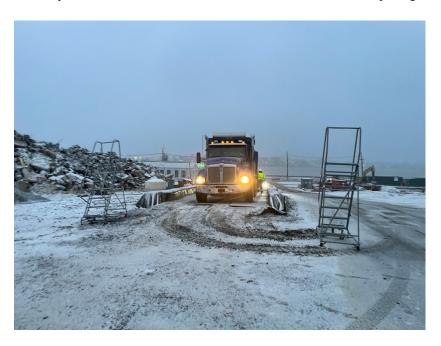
View of truck wash station, IRM 1 Central Area, facing west.
